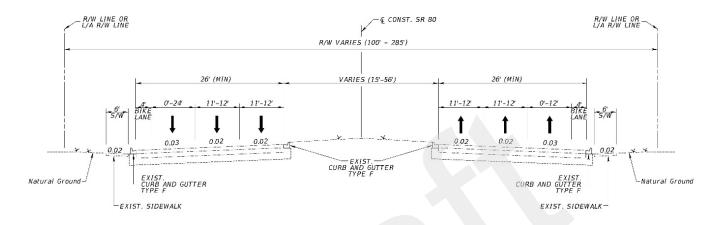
Existing Typical Section – SR 80, east of I-95
